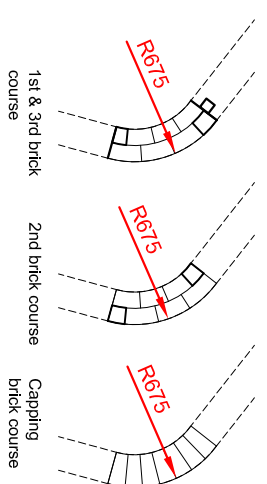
103 GA Plan-Wandle Trail Connection
